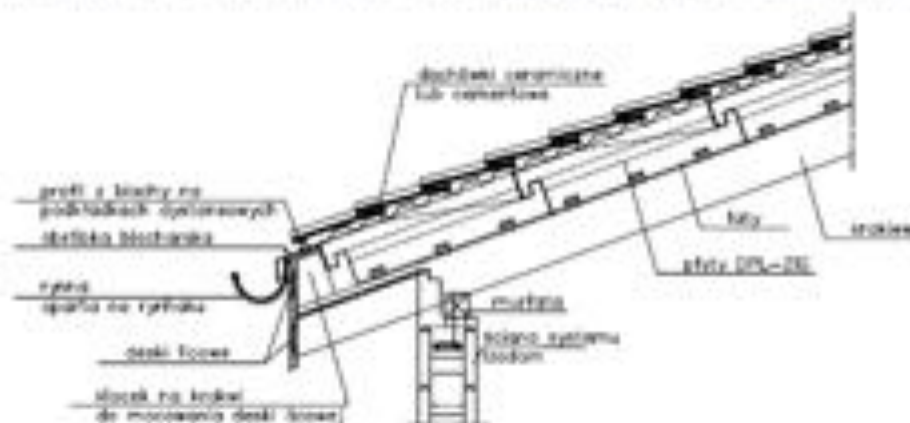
b. Rafter roof – ceramic or cement tiles in the eaves area (DPL-ZIG board, variant without cutting off the bottom lock) (dachówki ceramiczne lub cementowe – ceramic or cement tiles; obróbka blacharska – flashing; rynna oparta na – gutter resting on its bracket; deski ściowe – facing planks; łatki – battens; krokwie – rafters; murłota – top plate; klocek na krokwi do – block on the rafter to fix the facing board; płyty DPL – ZIG – DPL-ZIG boards; system Izodom – Izodom system wall; profil z blochy na podkładkach dystansowych – steel profile on distance washers).
